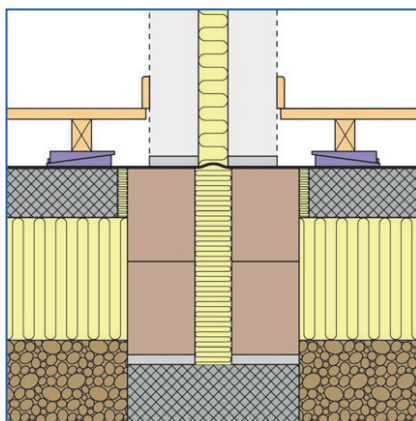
Example of Danish heavy cavity wall construction for new terraced housing fulfilling the Danish Building Regulations 2010. From [7], where more information about materials and dimensions can be found.
